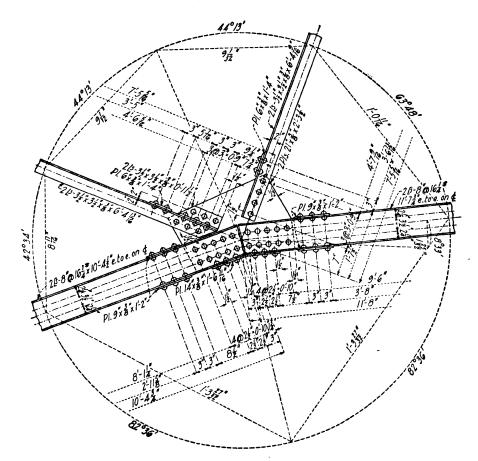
JOINT OF ROOF TRUSS COMPLETELY DETAILED. (Section of Shop Details of Roof Truss.)
